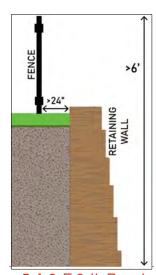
A-2-E-2-II: Requirement for fence location when retaining wall is not adjacent to walkway and fence + wall is taller than six
